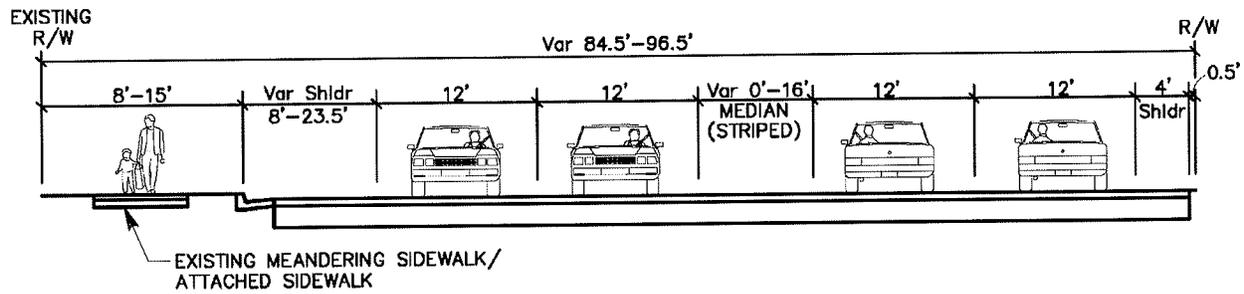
Segment 2 – Interim Roadway Section – Lower Sacramento Road to Legacy Estates (Looking East)
